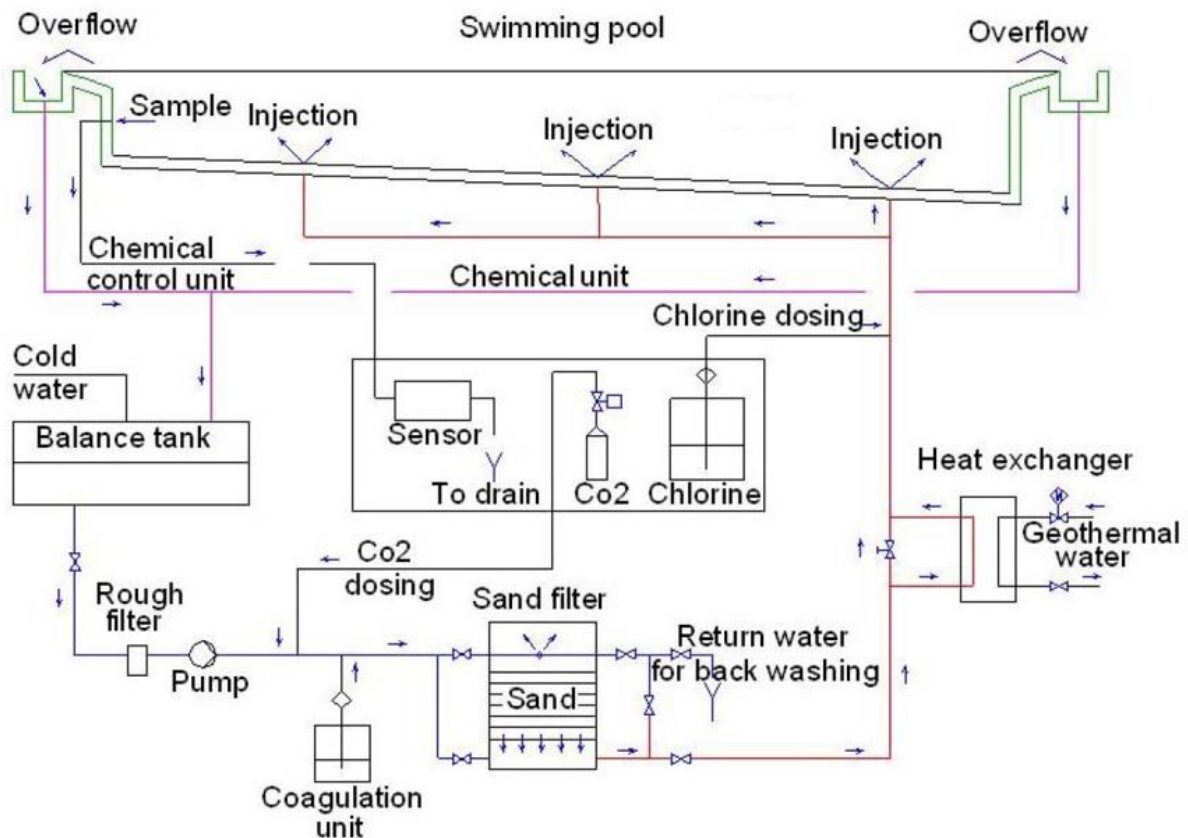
Proposed swimming pool layout (Jalili-Nasrabadi, 2004)
